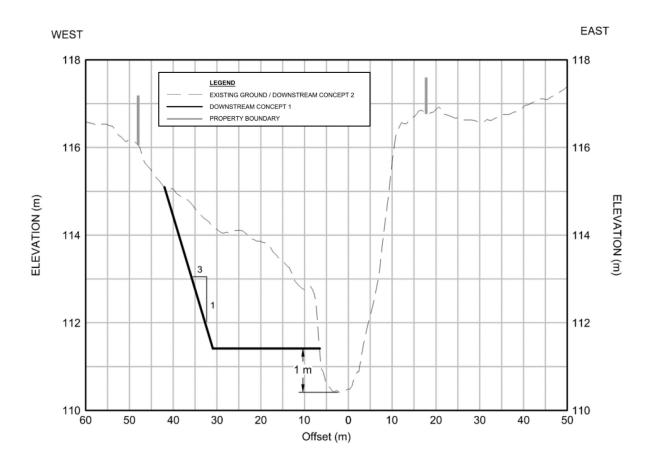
Cross-section - Dundas Downstream Alternative Concept 1 and Dundas Downstream Alternative Concept 2
